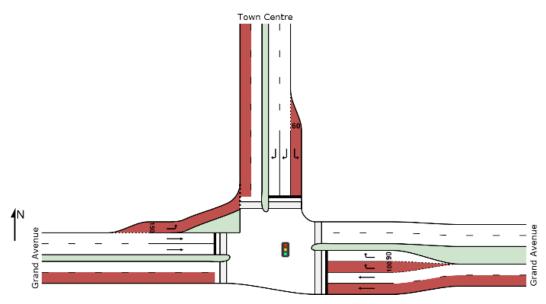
Intersection of Grand Avenue and Town Centre Street
